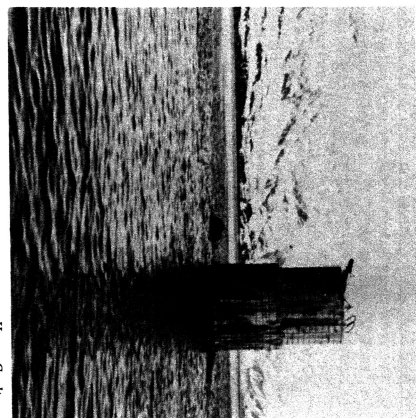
Concrete pylon of the navigation light located at the entrance to Port Valdez (for location see Figures 79 and 96). The light was destroyed by a huge wave that passed southward out of Valdez Narrows. Steel reinforcing rods at an elevation of about 37 ft above MLLW were bent in the direction of flow.
